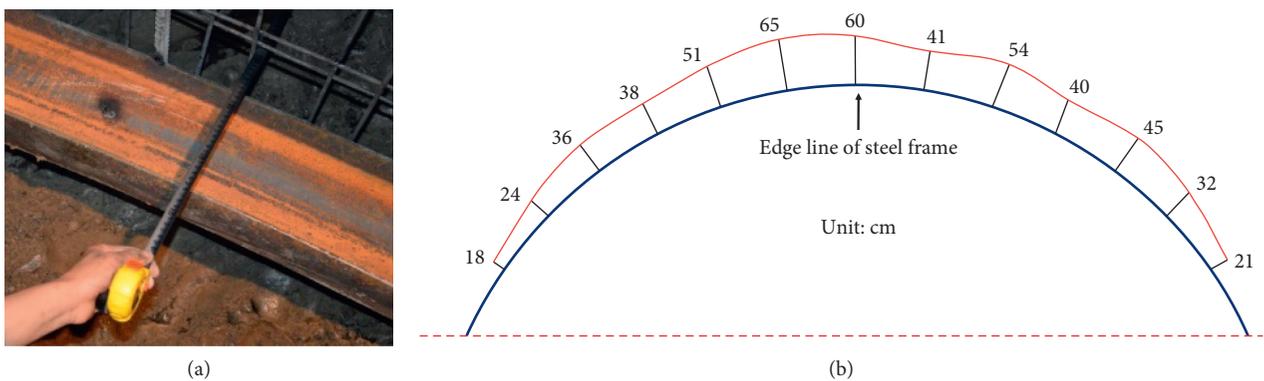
Measurements of step overexcavation on section ZK4357 + 801 of left line. (a) Overexcavation measurement of vault edge (65 cm). (b) Overexcavation sketch at the top.
